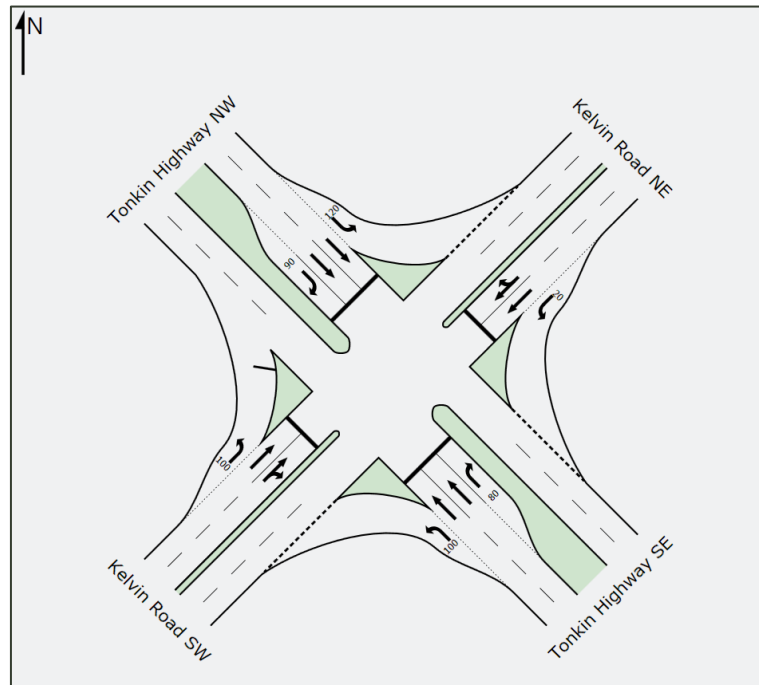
Tonkin Highway/ Kelvin Road intersection layout
